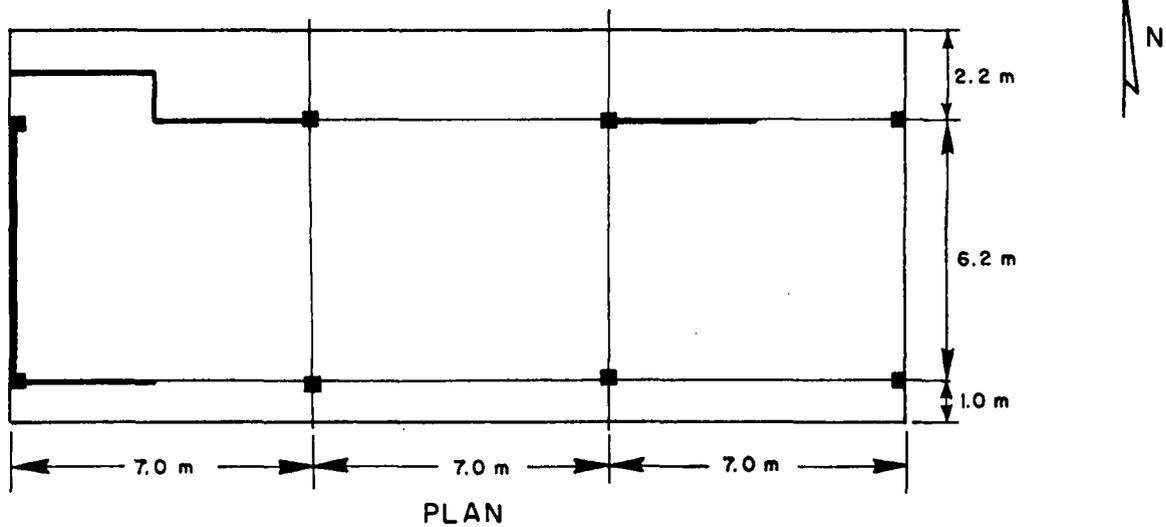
Plan view of Maruyoshi Building, Oroshicho area. Note overhang to the north.
